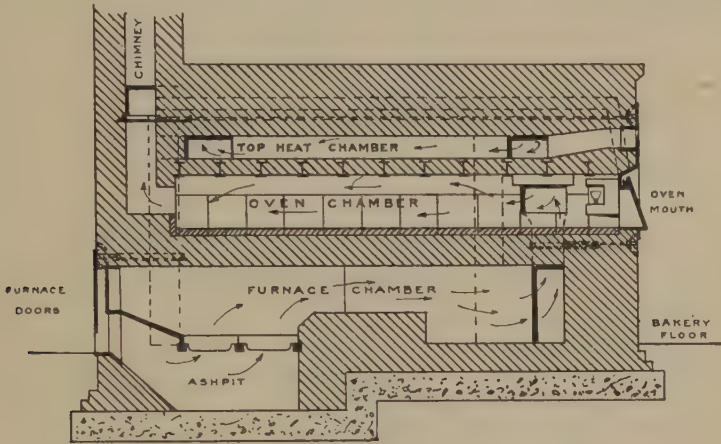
Section of Hot-air Peel Oven (fired at back)
